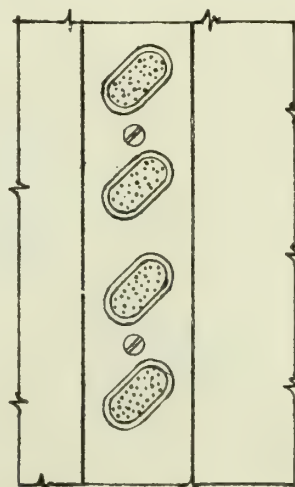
DETAIL SHOWING TREADS RISERS AND ADJUSTABLE BALUSTRADE
